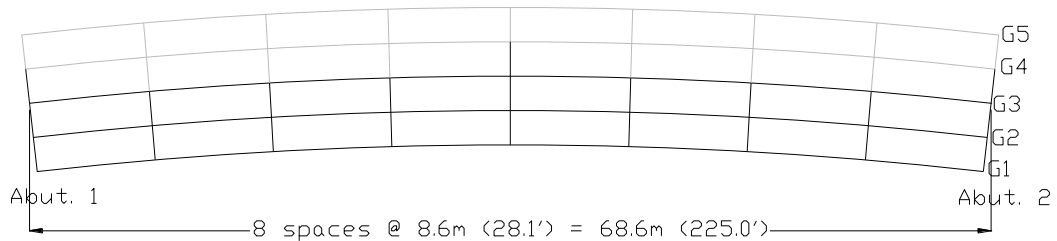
Stage 3 of Construction for Single Girder (Inner Girder Placed First) Erection of Single-Span, 5-Girder, 305-m (1000-ft) Radius Bridge.
